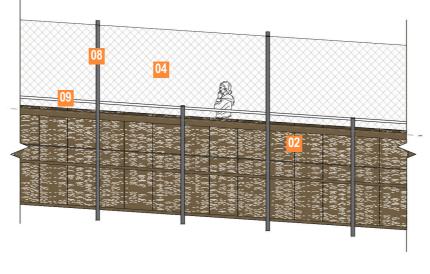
Ridge Street Active Transport Bridge - Plan D 1:100
